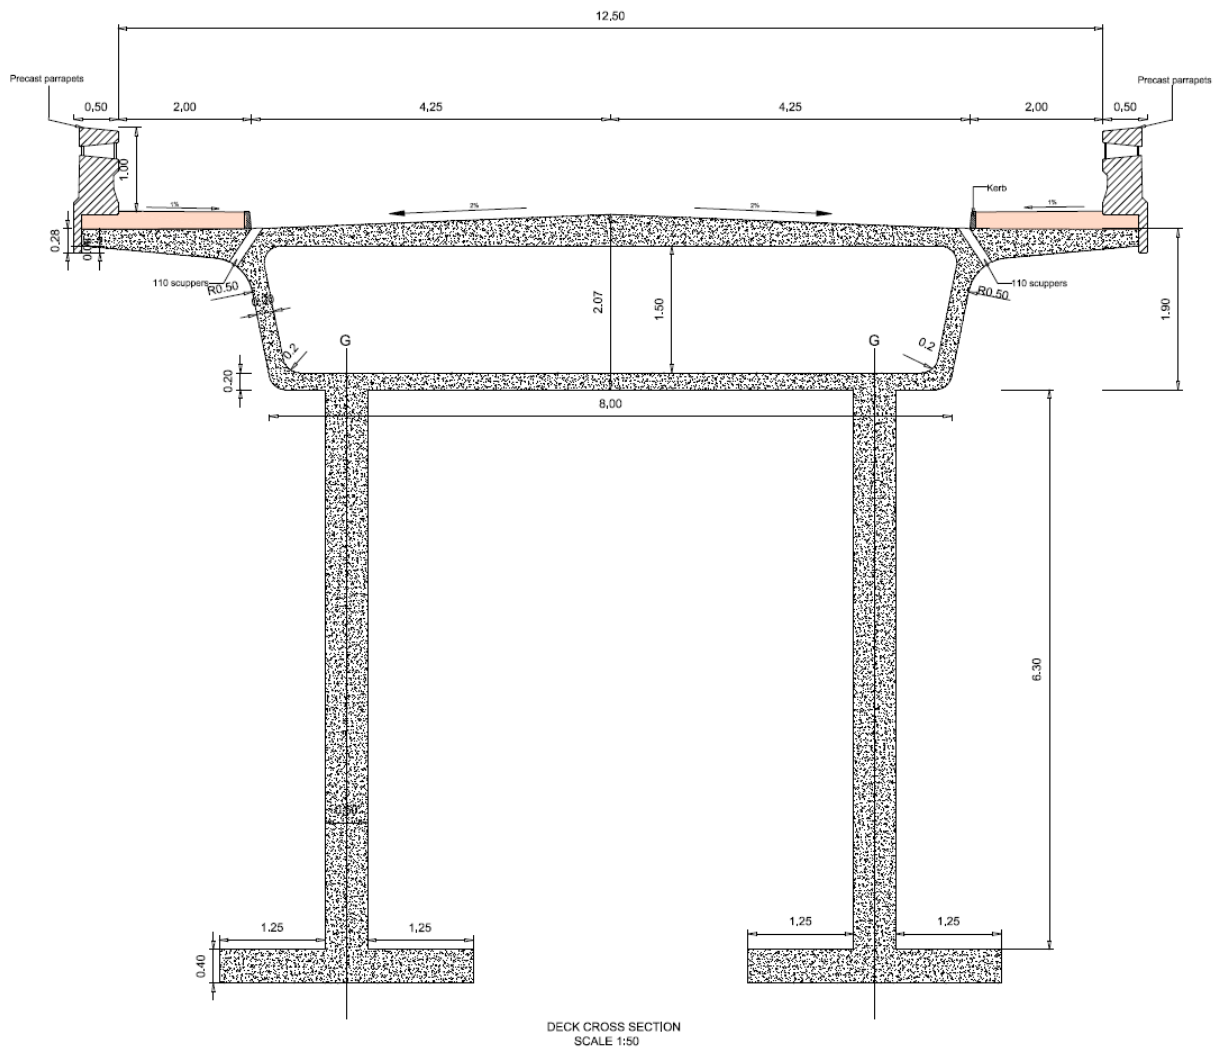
Design of the proposed bridge (Refer to Appendix B6 for the full design drawing)
